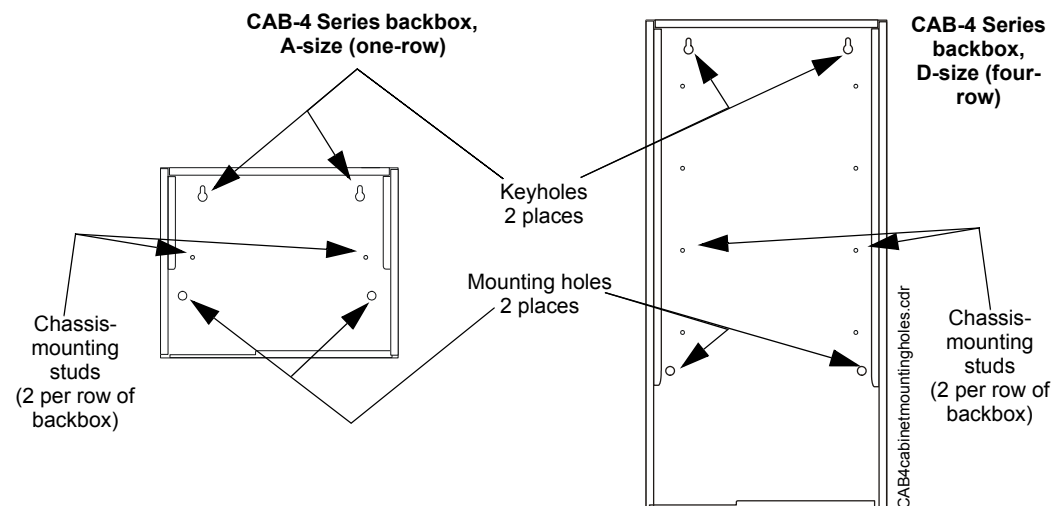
Backbox-Mounting Holes and Chassis-Mounting Studs
